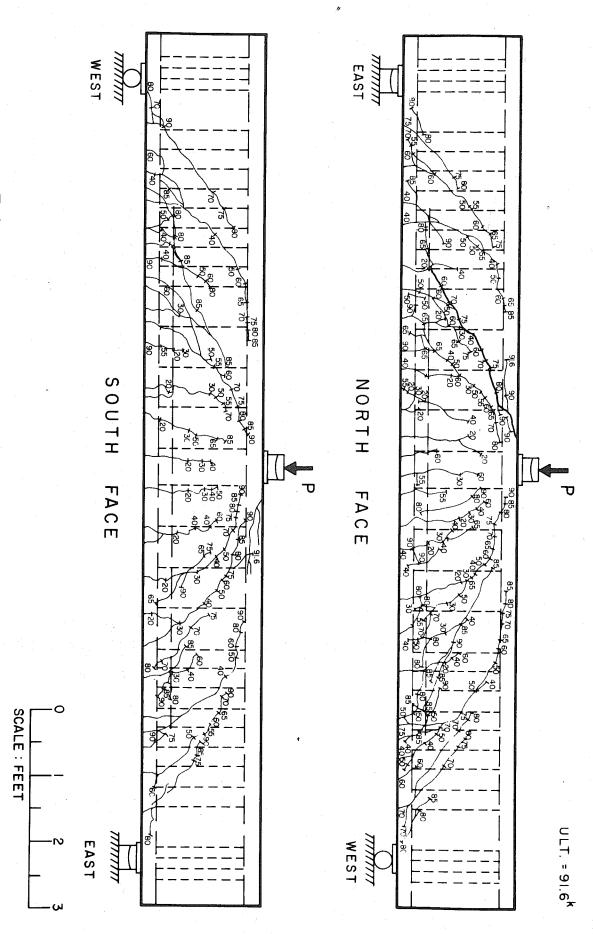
E BEAM I WCRB-I CRACK PATTERN
